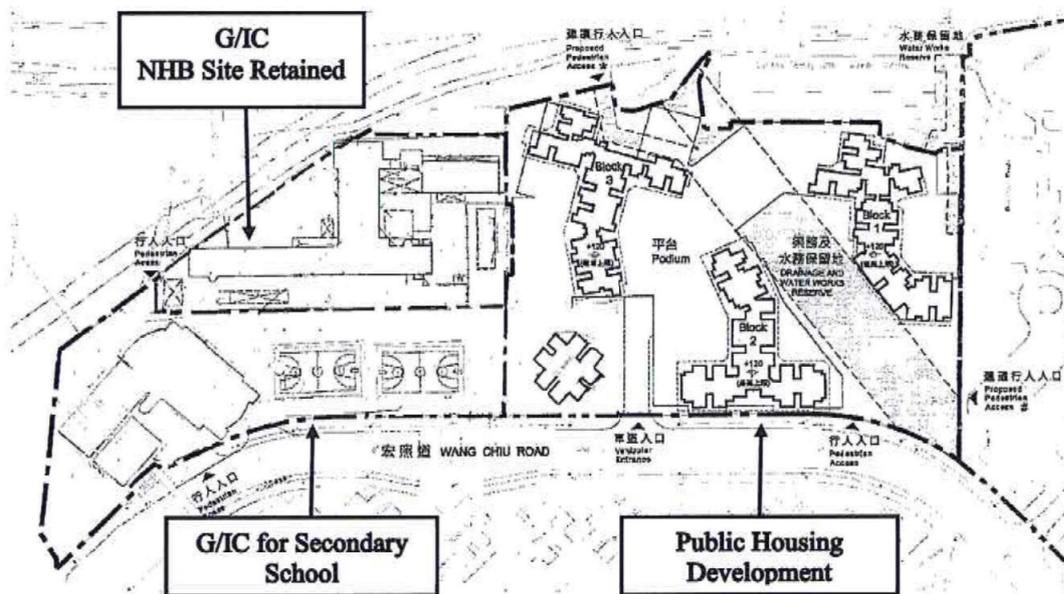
Indicative Layout Plan of the Alternative Option for WCR Site
